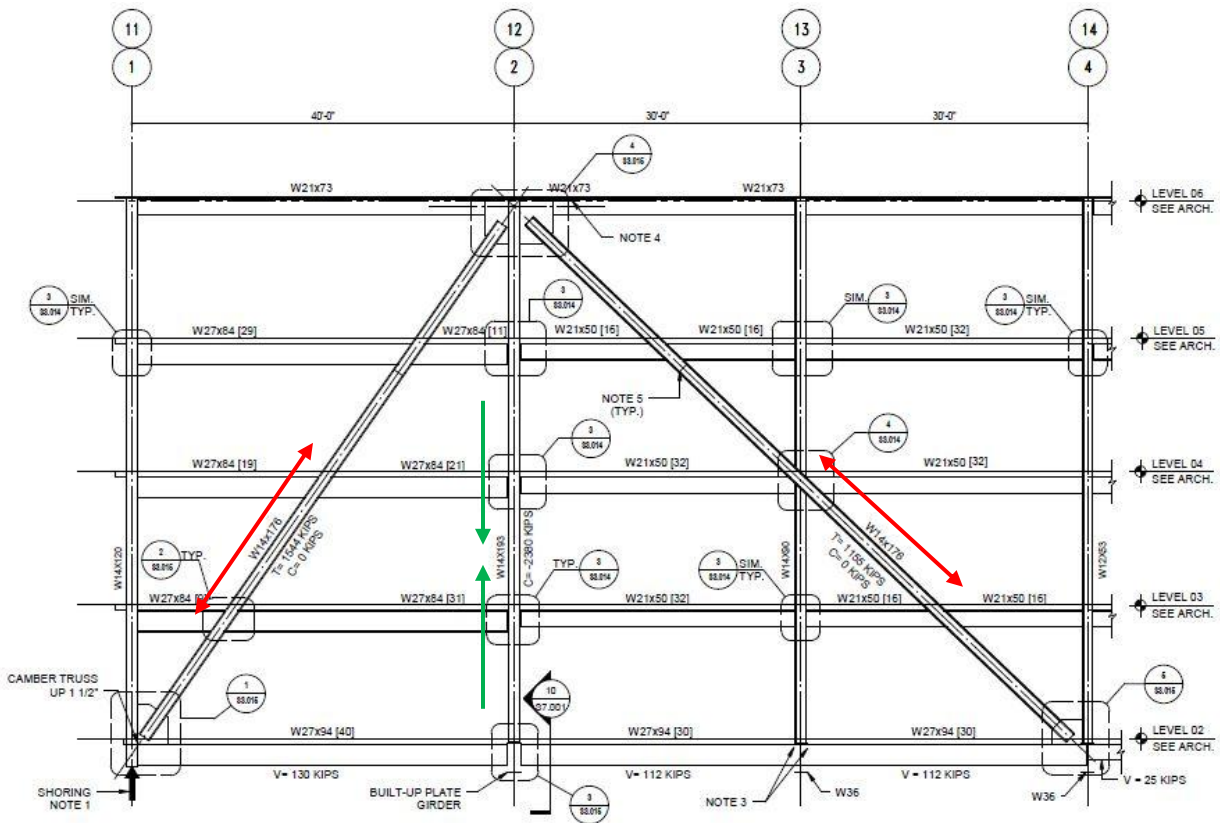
Truss T2 Elevation Highlighting Tensile and Compressive Forces
